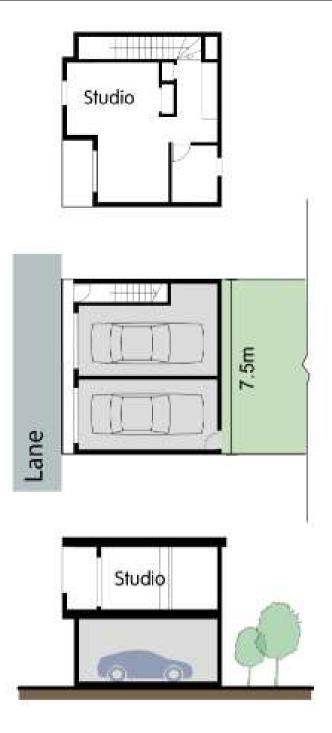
Typical Studio Dwelling Typology with One Parking for Terrace and One Parking for Studio
